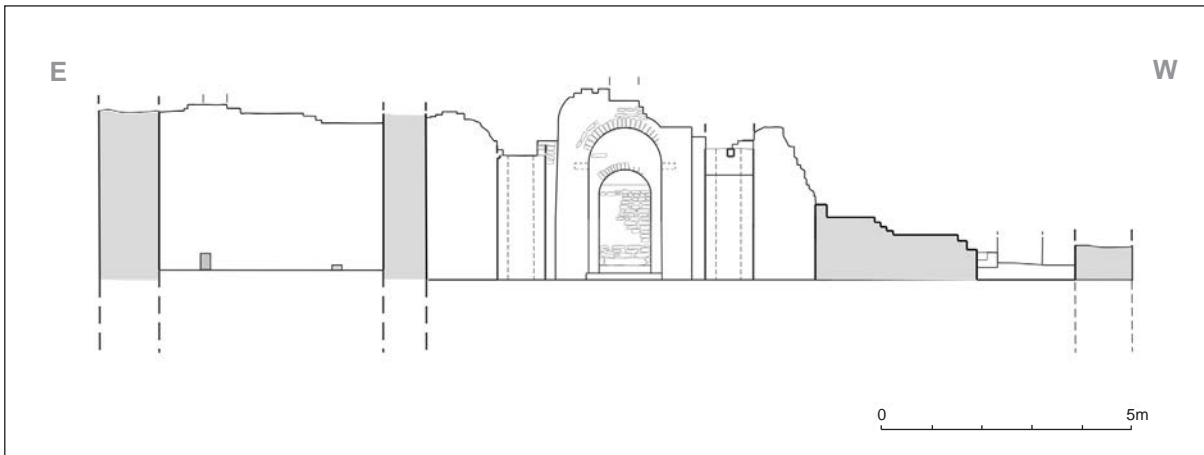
East-west section through the church looking at the south wall with the southern entrance
